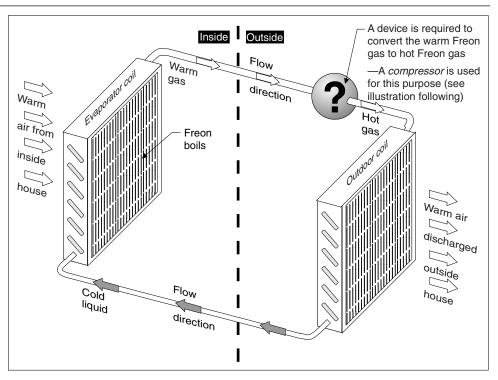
Evaporator Coil—Collecting Hot Air Inside the House
